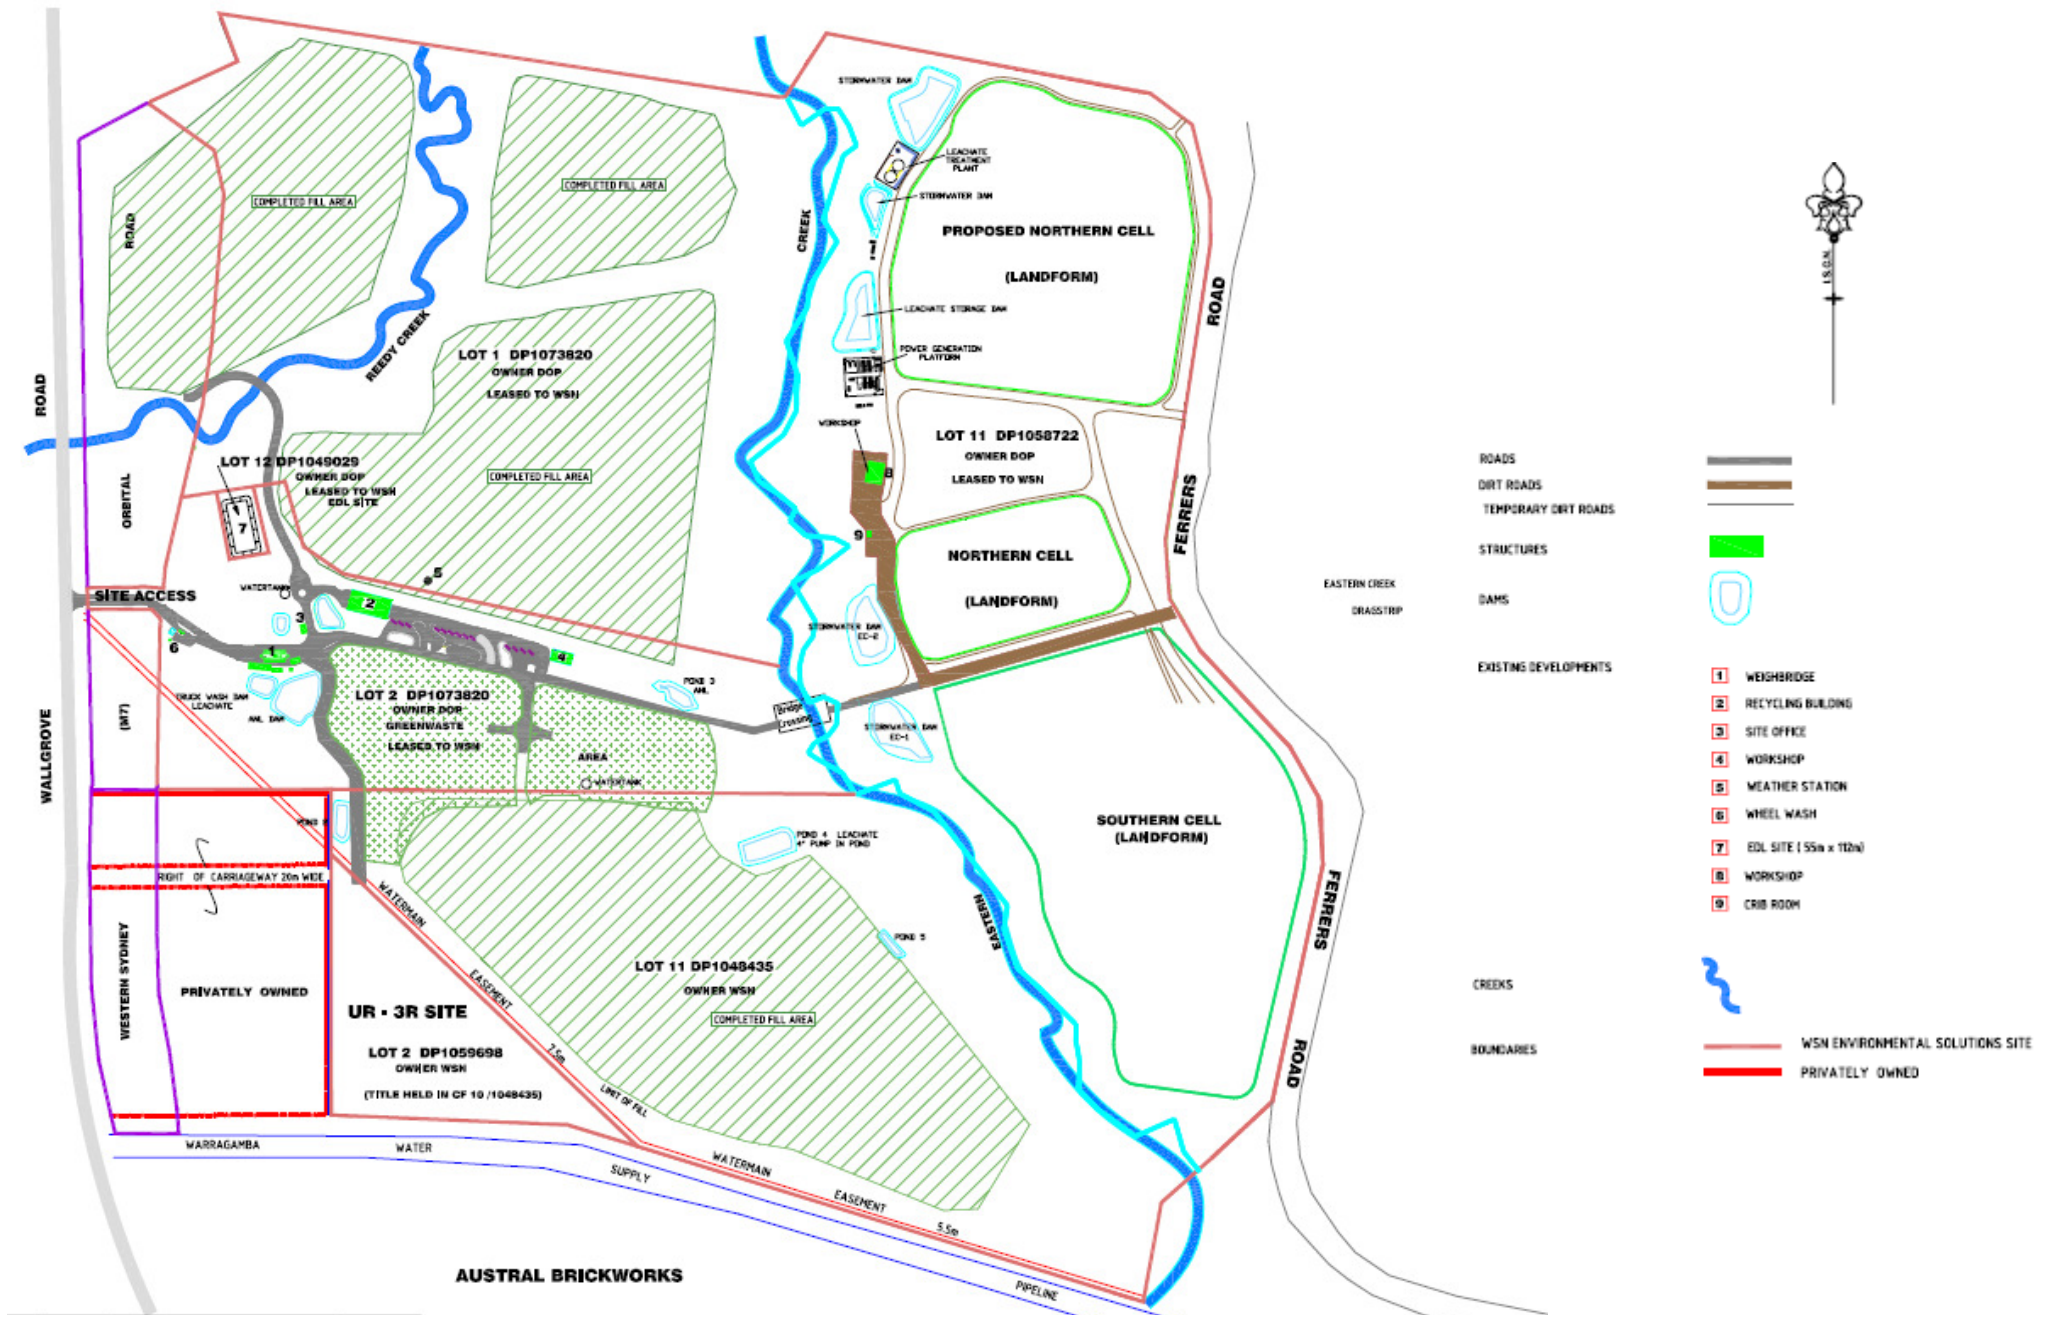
Site Plan and Cadastral information (Subject Site stippled green)
